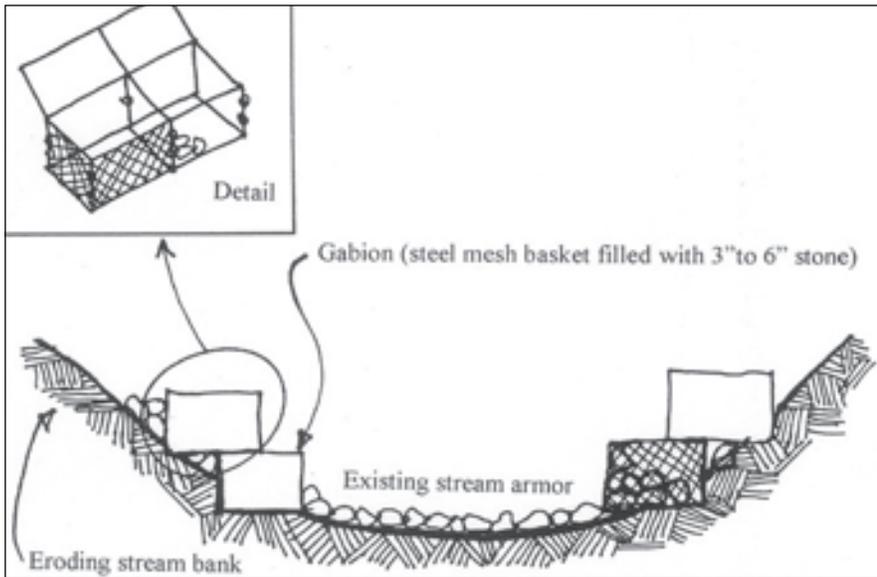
(top). Gabion streambank armor cross-section as installed in 1992 to protect eroding streambanks. Flank, crest, foundation and toe protection are critical for success. Note lack of stone foundation.
